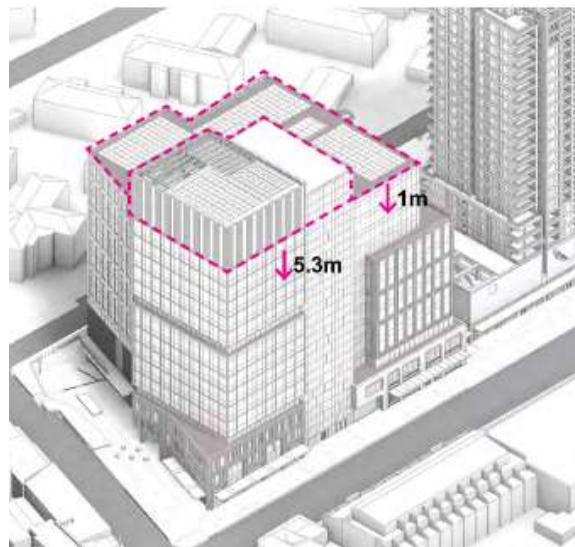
Axonometric View (North West Aerial) indicating extent of Building 1 reduction from the as-submitted development application (Source: Woods Bagot, Indicative only)
